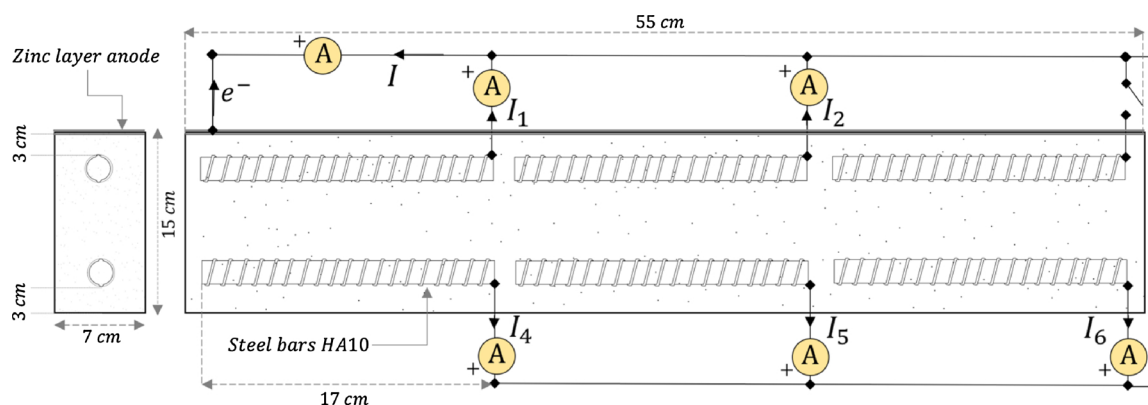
Experimental specimen: small concrete beam in dry condition (easy oxygen transport) embedding 6 independent passive steel rods (test1).
